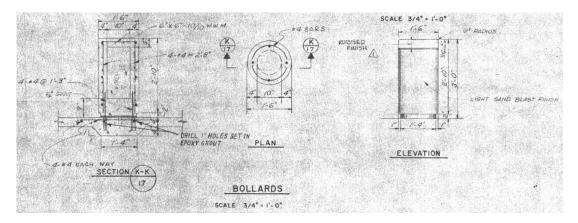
Sasaki's design for the cultural landscape called for decorative concrete bollards in the north and south play areas. (Excerpt from David Volkert & Sons 1967: Sheet 20)
